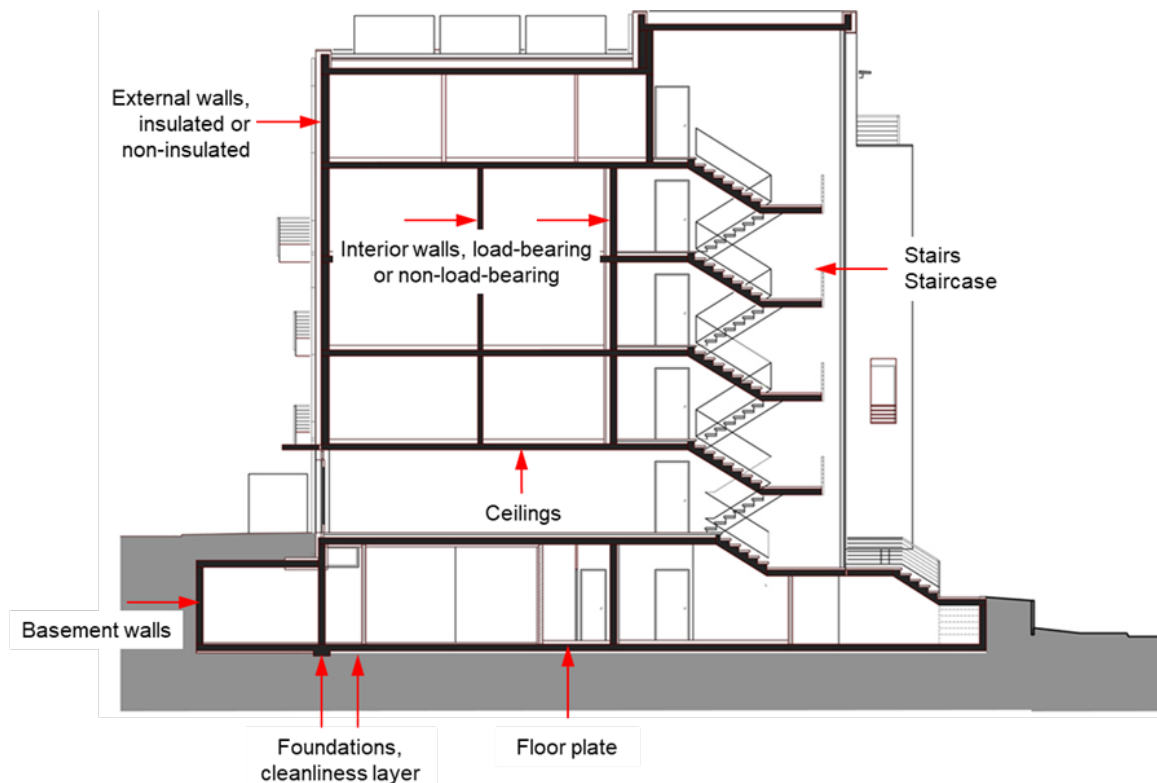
Example of building components manufacturable out of concrete with recycled aggregates (Image source: Stefan Poggel, Poggel Architekten)
